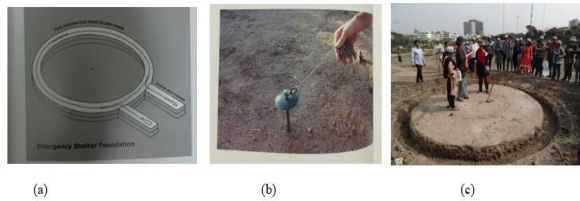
Step-2: (a) Theoretical dome layered foundation (b) Centre scale on site (c) Foundation on the constructed site
